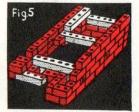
Section of back wall showing construction of roof. Bricks "BB" are also seen in Fig. 6.
